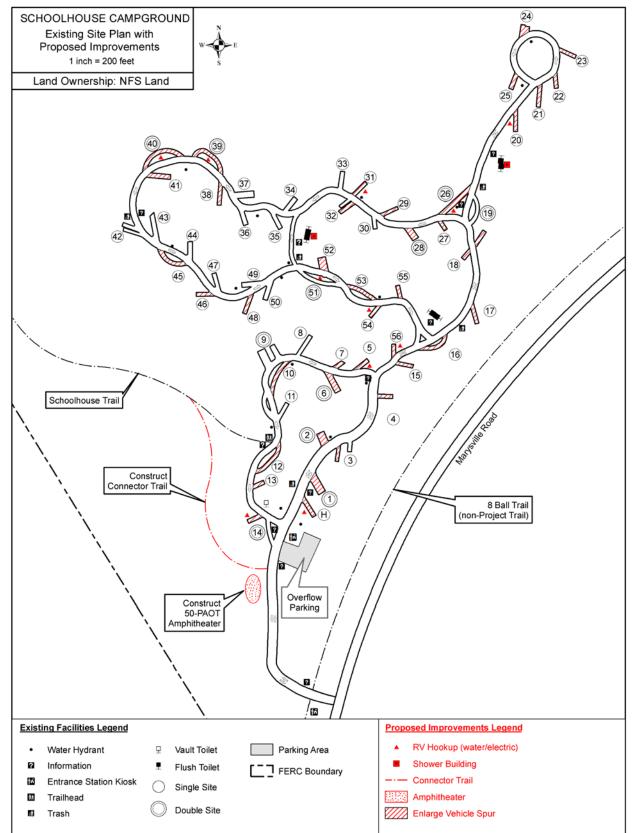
Existing site plan with proposed improvements for Schoolhouse Campground.
